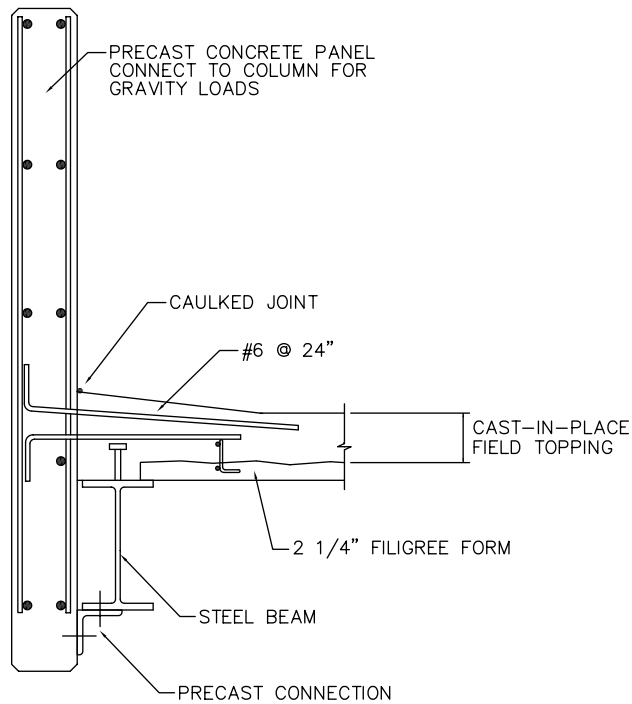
Typical Precast Connection to Steel Beam and Slab
